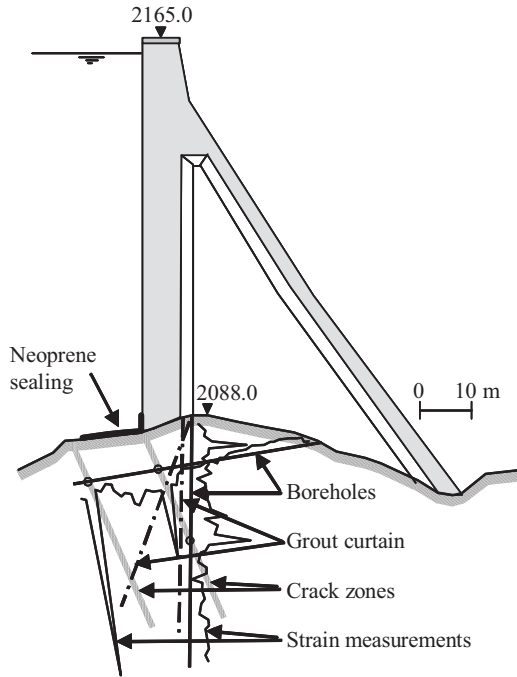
Albigna hollow gravity dam cross section. Foundation investigations and position of the fissure zones and the neoprene sealing.
